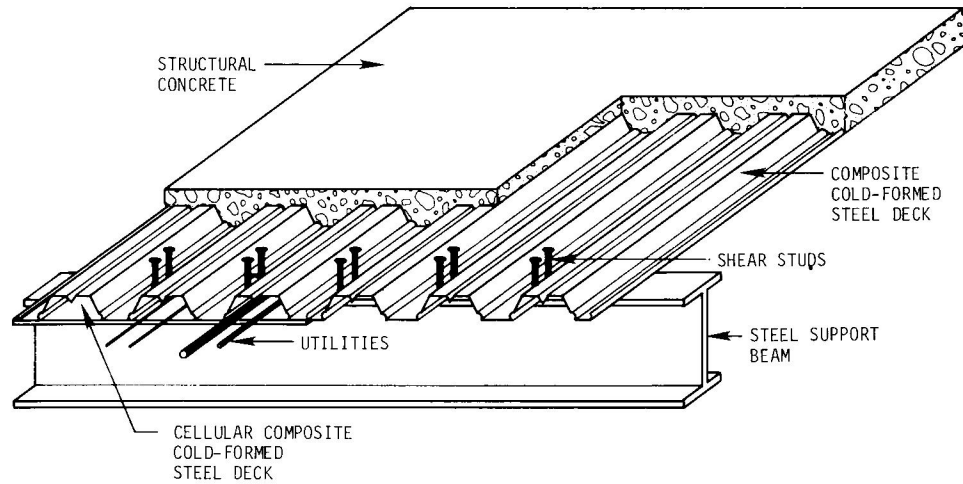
Typical construction utilizing cold-formed steel decking with composite support beams.
